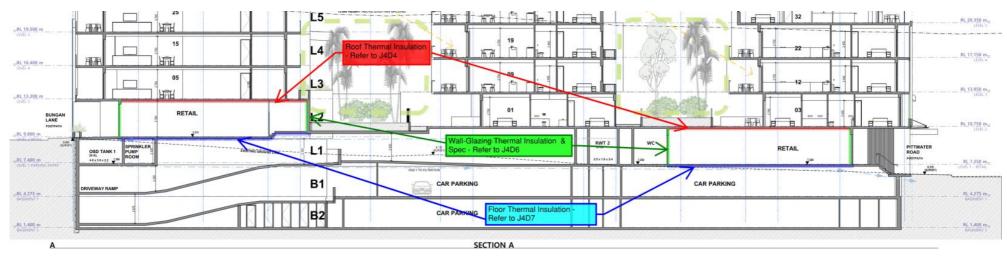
Section view of Identified Conditioned-Envelope Building Fabric Thermal Insulation
